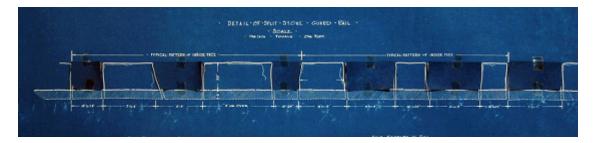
Detail of rectilinear guardwall stones on Kebo Mountain Road, 1936. (U.S. Department of Agriculture, Bureau of Public Roads, Project 6A1, Sheet 14 of 14, 1936)
